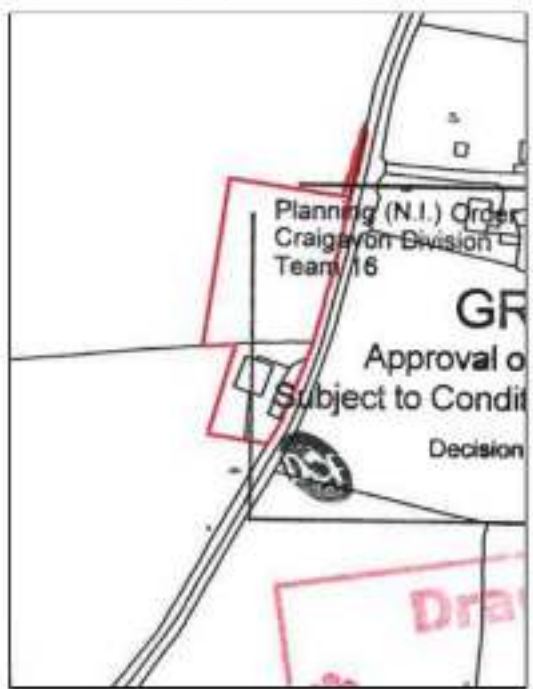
Extract from Site Layout Plan drawing number 9775-04 (application reference P/2007/0558/RM)
